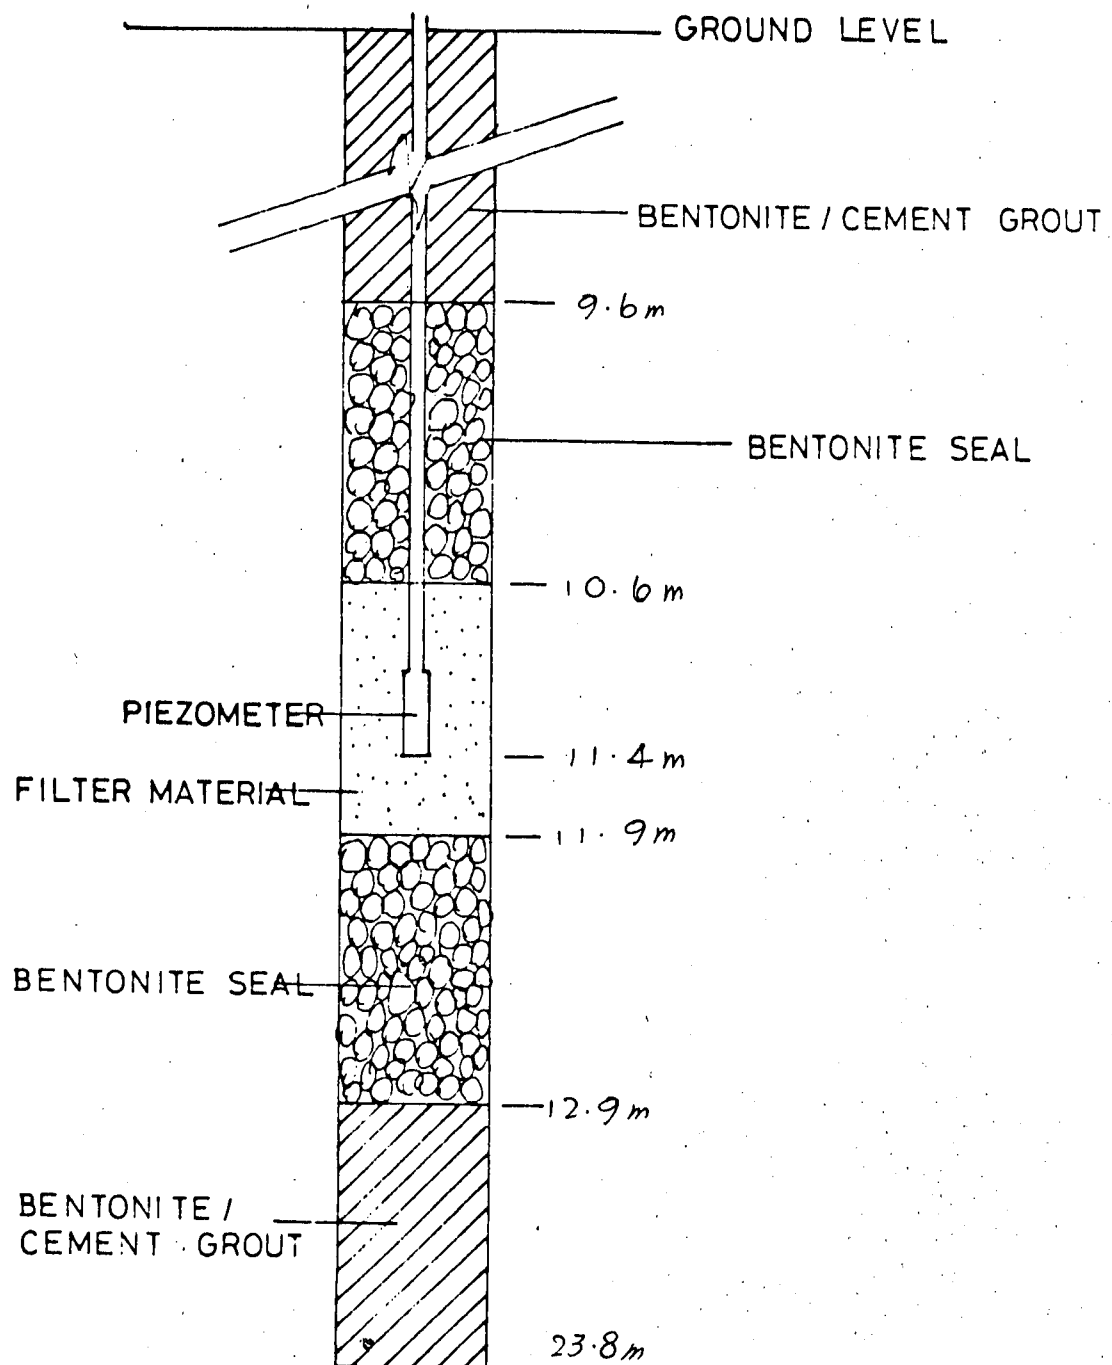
# DETAIL OF STANDPIPE PIEZOMETER INSTALLATION
